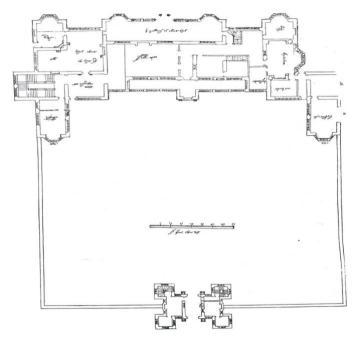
Plan of Clifton's house by Thorpe (c.1605) showing proposed Manor House linked by walls to the extant gatehouse. Scale 14 ft to the inch. From Summerson (1966).
